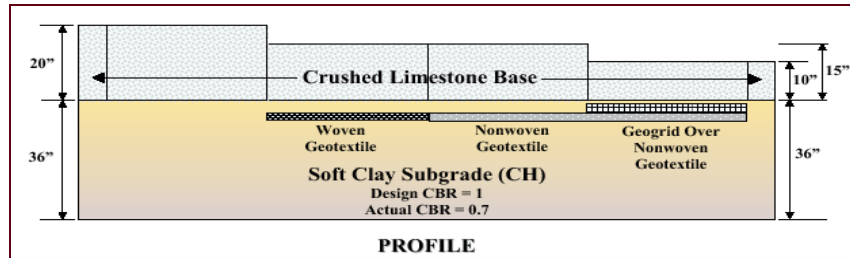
Illustration. Layout of 1995 test section profile (not to scale).
